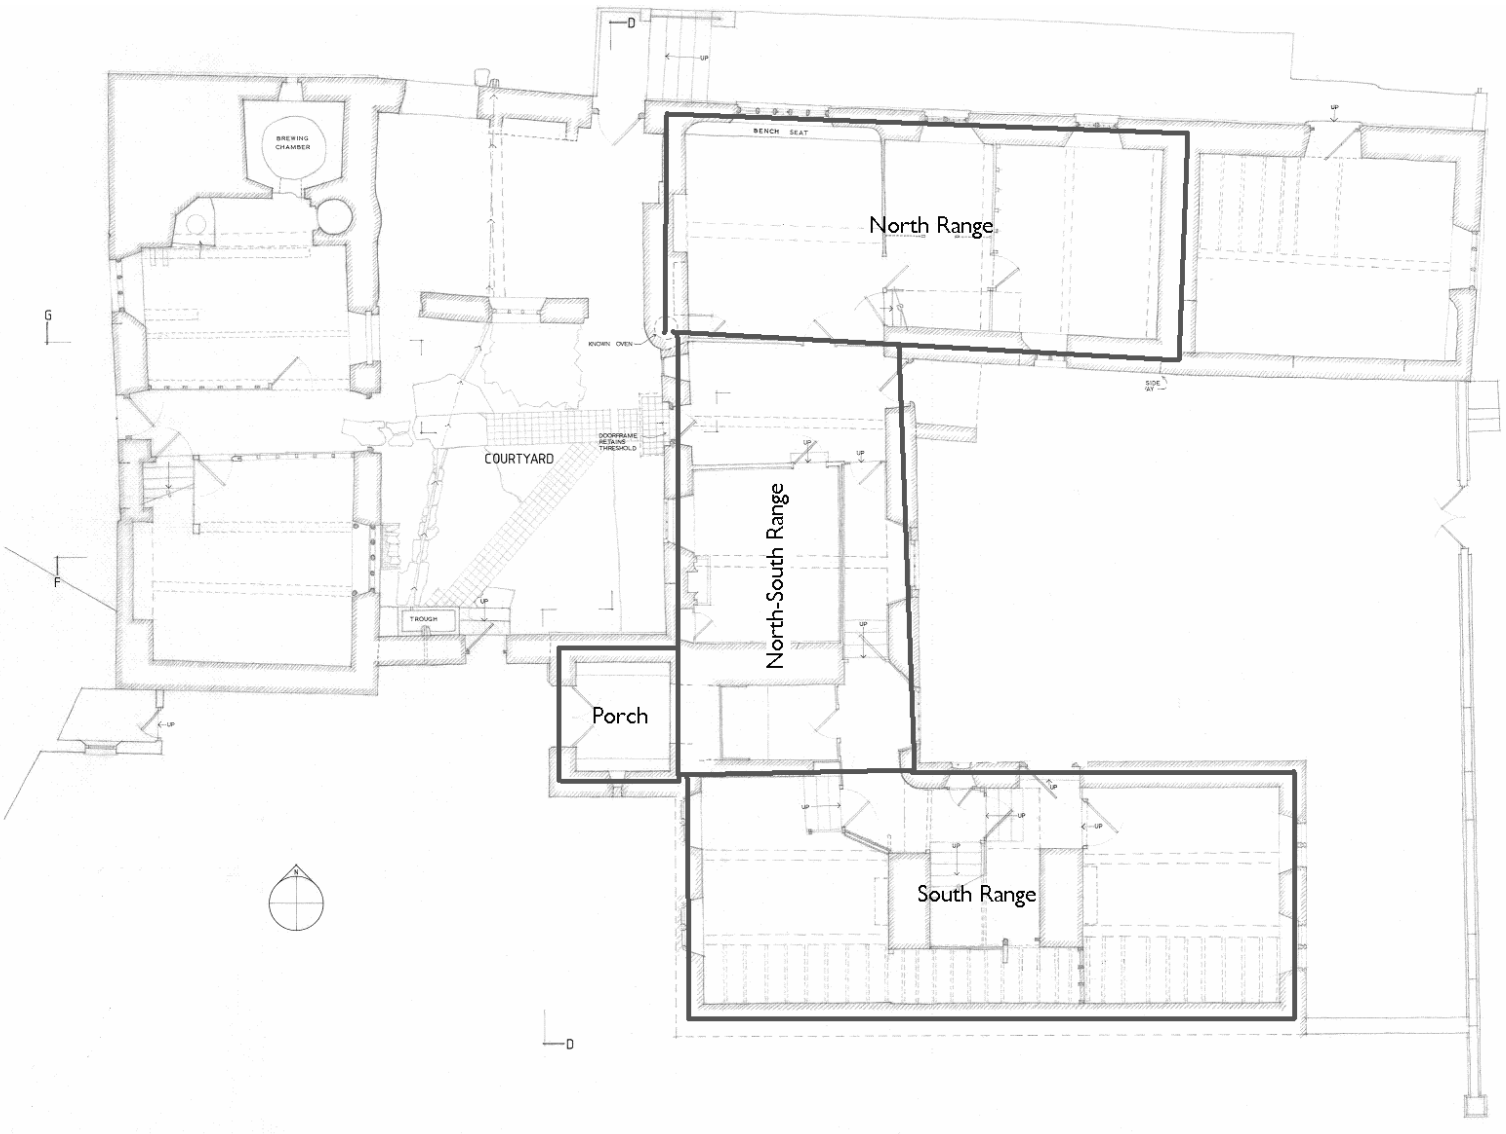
Yarde Farmhouse, at ground-floor and (South range) cellar level, areas under investigation outlined (Architecton)
